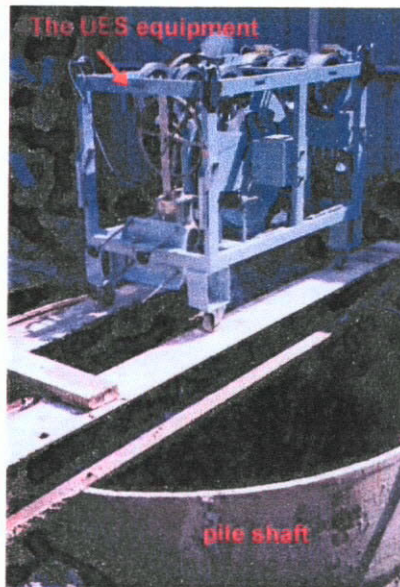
Experimental set-up in which the UES equipment, being supported by two H-steel beams, was put on a test drilled shaft.
